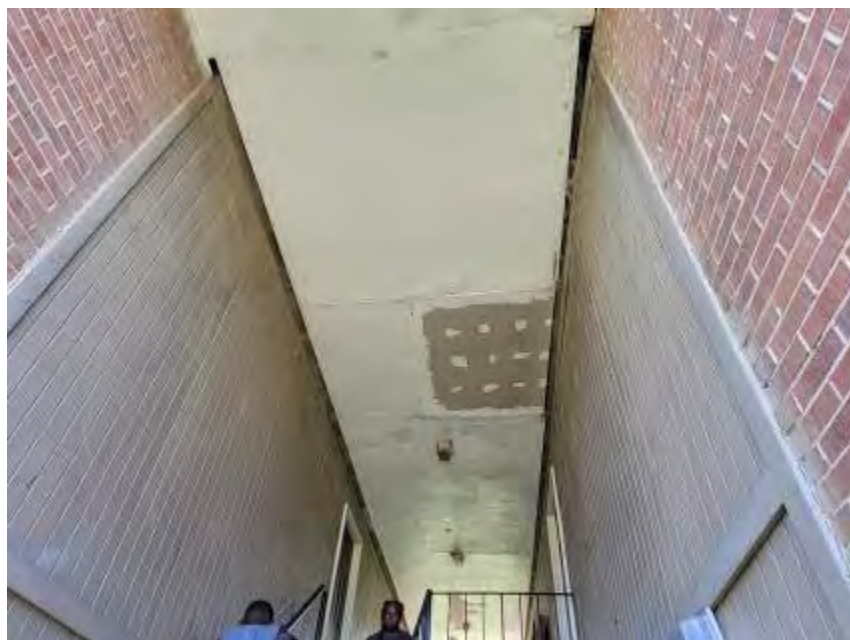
Breezeway and stairs (fire damaged building).
